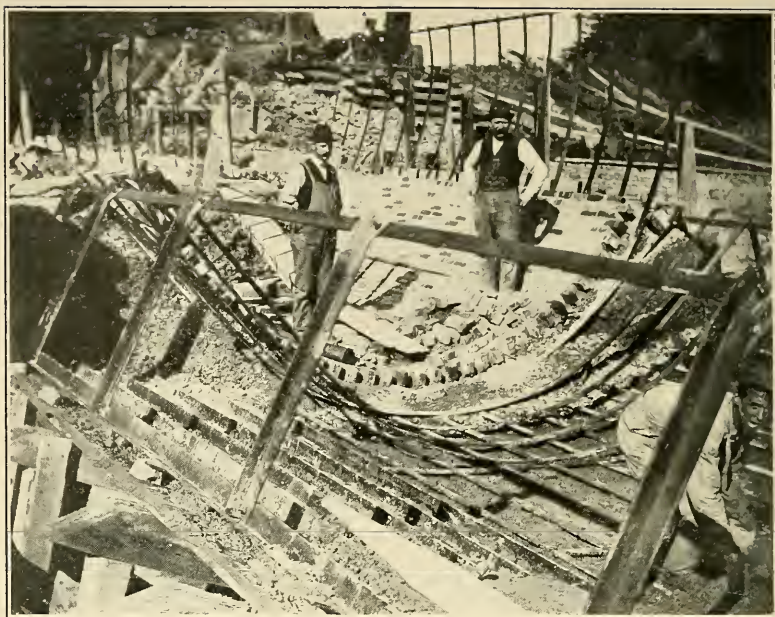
SHOWING TUBULAR BRIDGE CONSTRUCTION OF 13' 6" SEWER AT NINE-MILE CREEK CROSSING.
